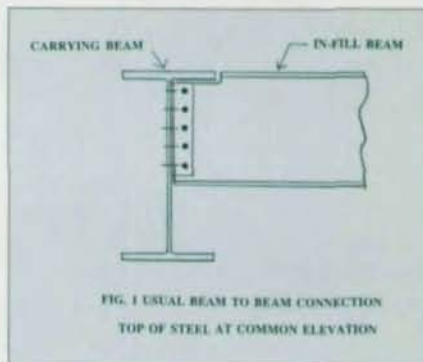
USUAL BEAM TO BEAM CONNECTION
